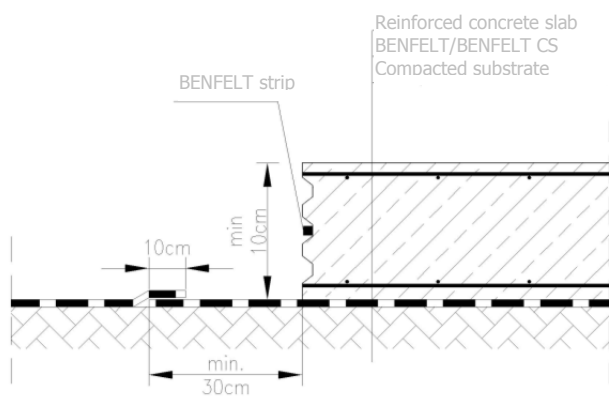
Construction joint in concrete works of the foundation board – on layer of stabilised soil ground.
